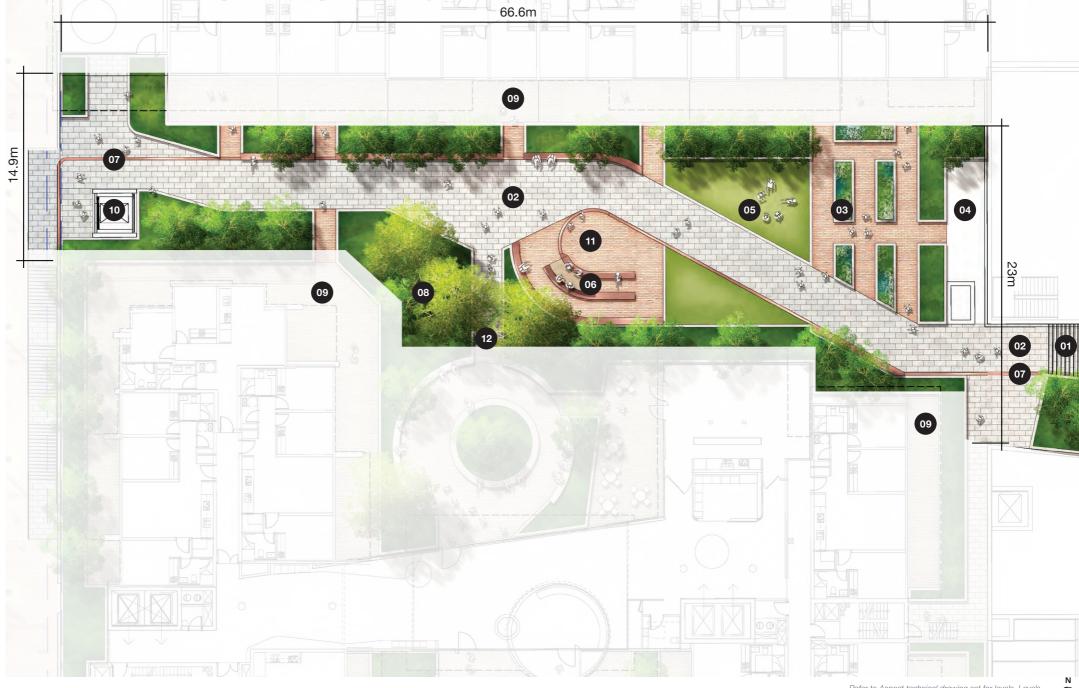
Illustrative Plan: Paper Trail Gardens
